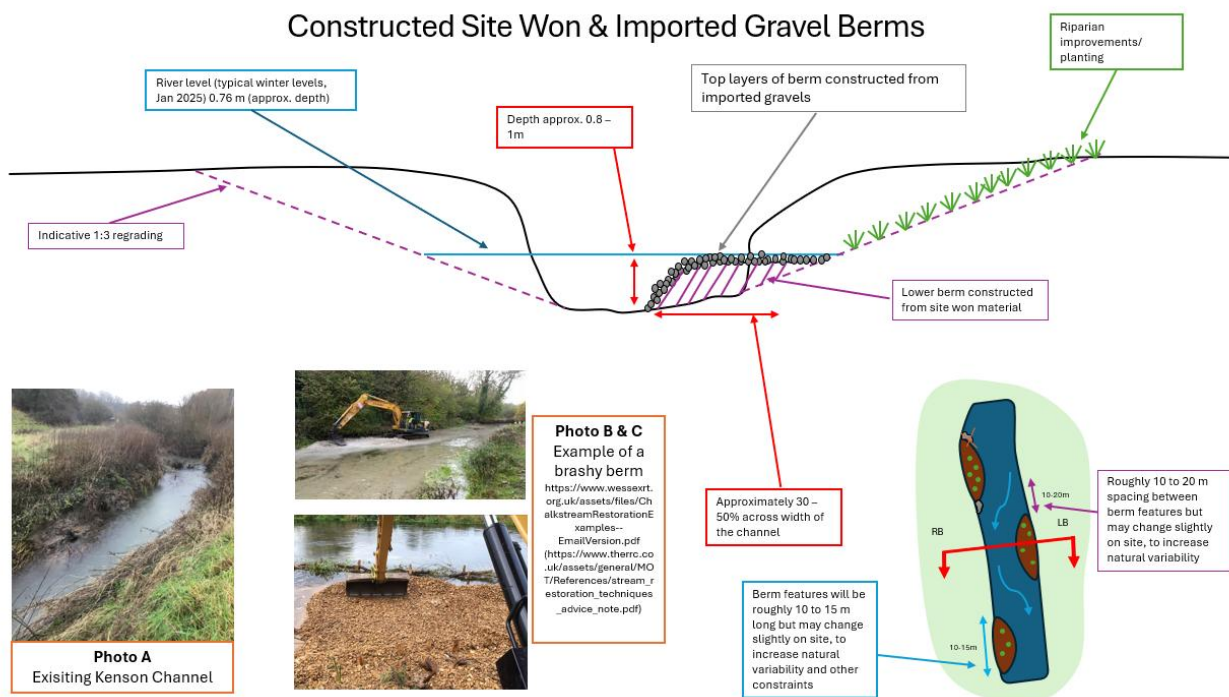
Indicative diagram of constructed site won and imported gravel berms
